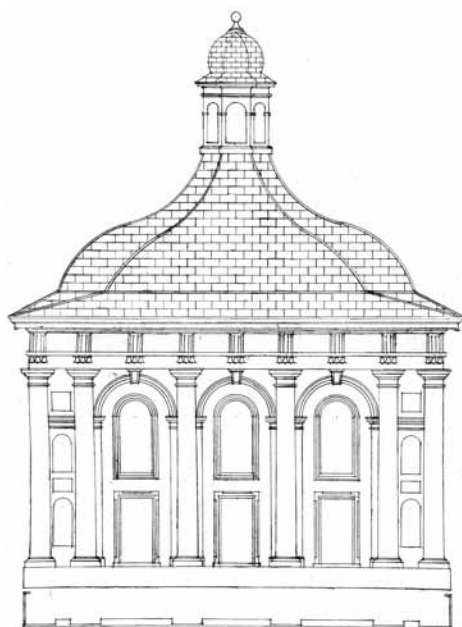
Simon Pitz (attributed to), design for a building, elevation, AKJK, photo: K. Blaschke
